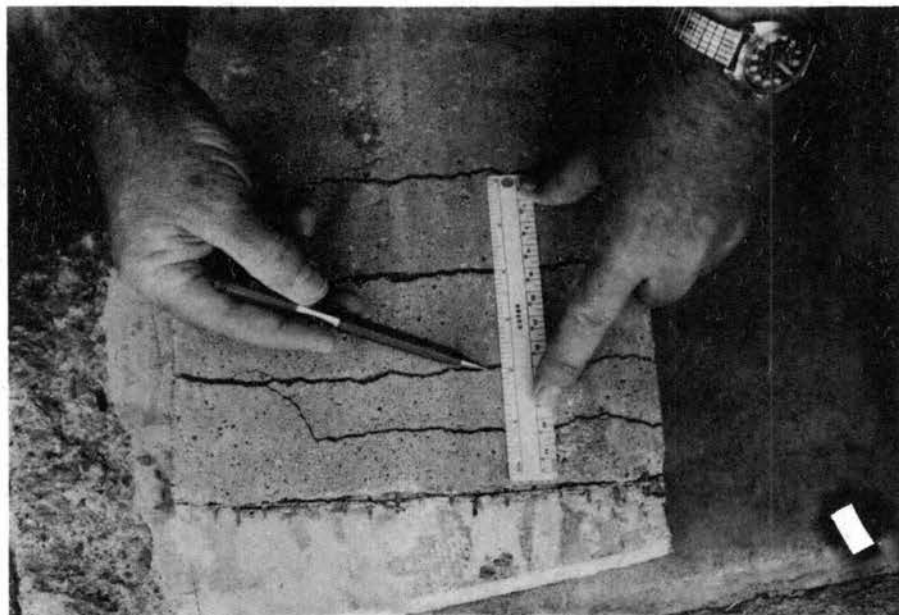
Panel 14-1 Showing Crack Spacing at Cross-wire Locations, With One Inch Crosswire Spacings.
